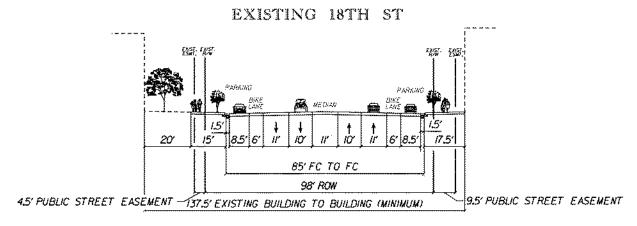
Existing 18th Street S Cross Section (looking east toward Route 1)
